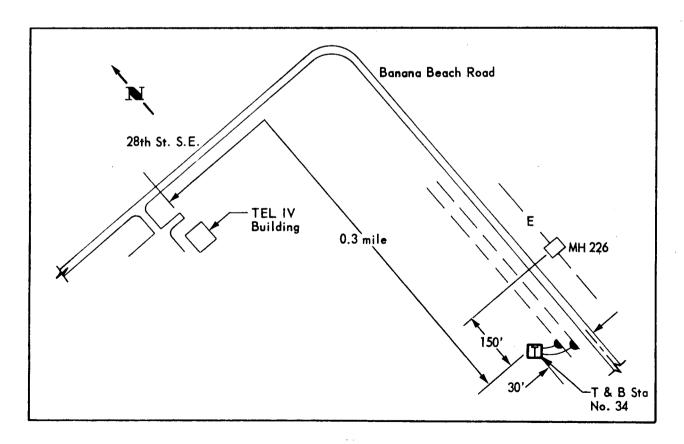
Test and Bond Station No. 34 Equipment Locator Changed 1 March 1972
